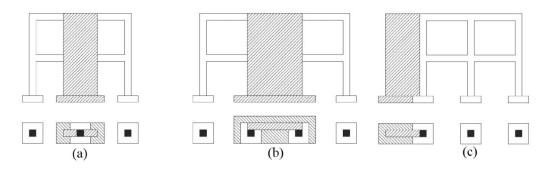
Addition of RC walls (a) placed around a column, (b) external to the frame, (c) as buttress
